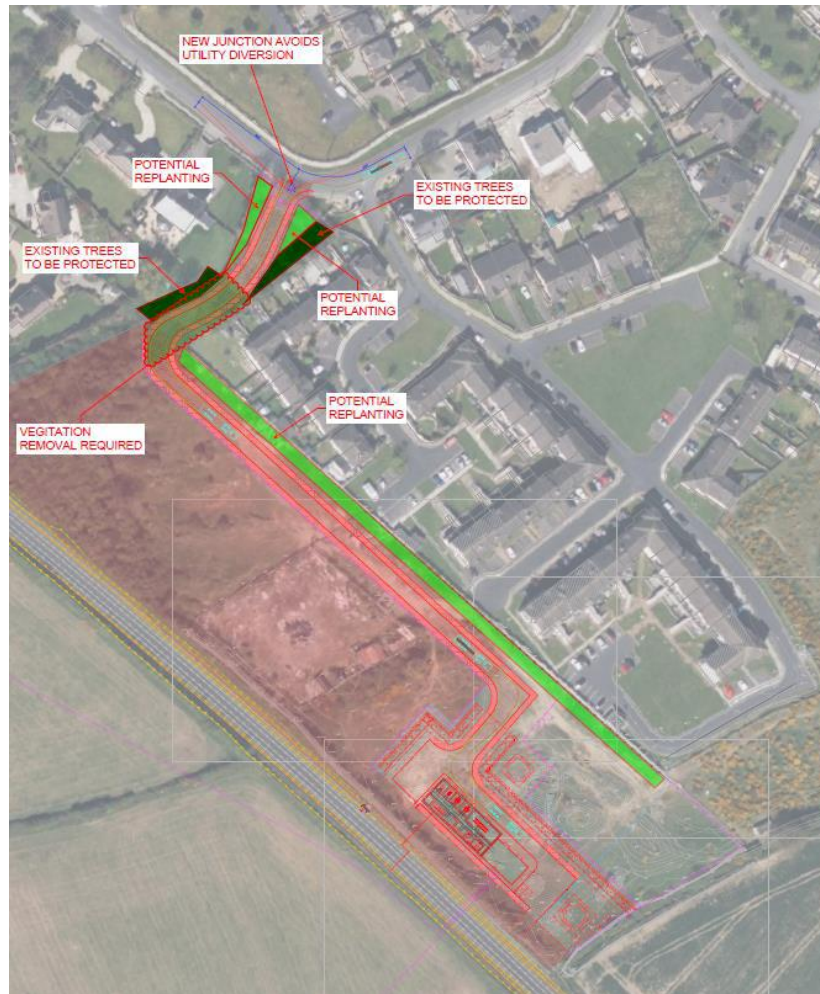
Sketch showing access arrangements (revised during design development) for proposed Bettystown Substation
